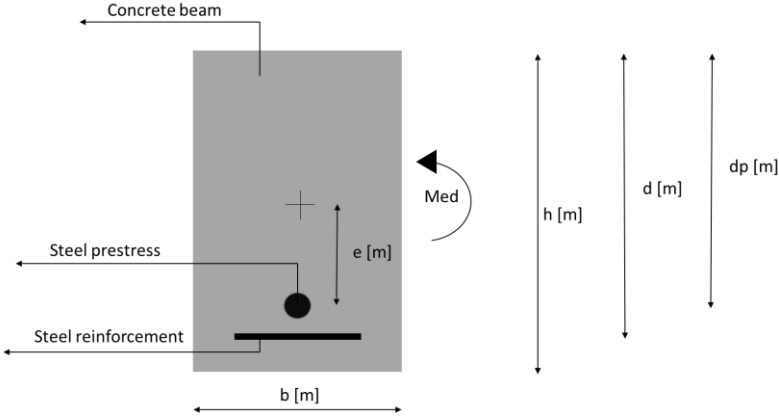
Prestressed RC beam- Steel rebar and steel tendons
